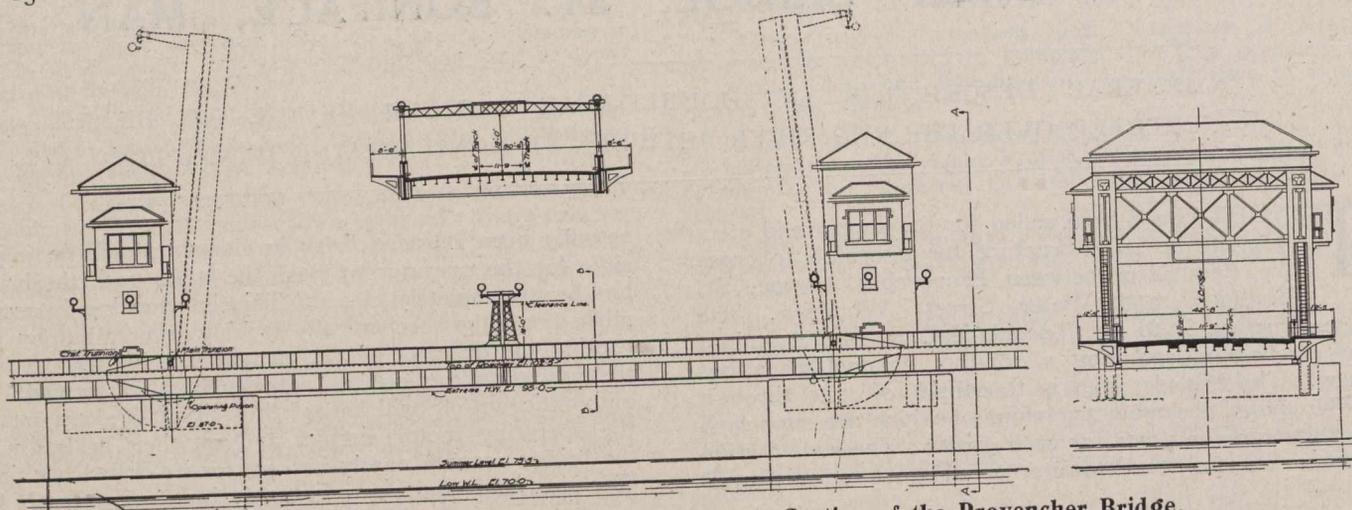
Elevation and Sections of the Bascule Section of the Provencher Bridge.
